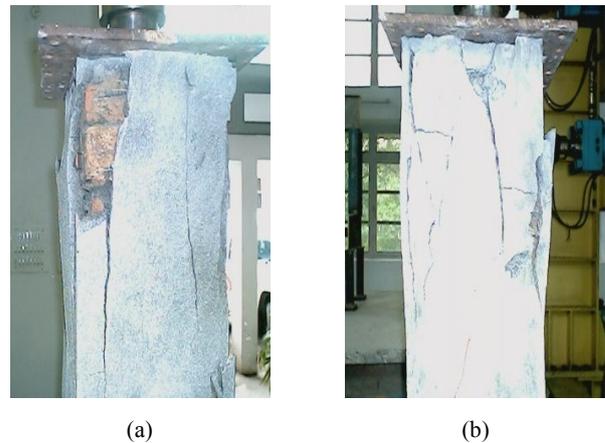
Test specimens (a) spalling of mortar at the upper left corner and (b) mortar cracking through-out the specimen's face
